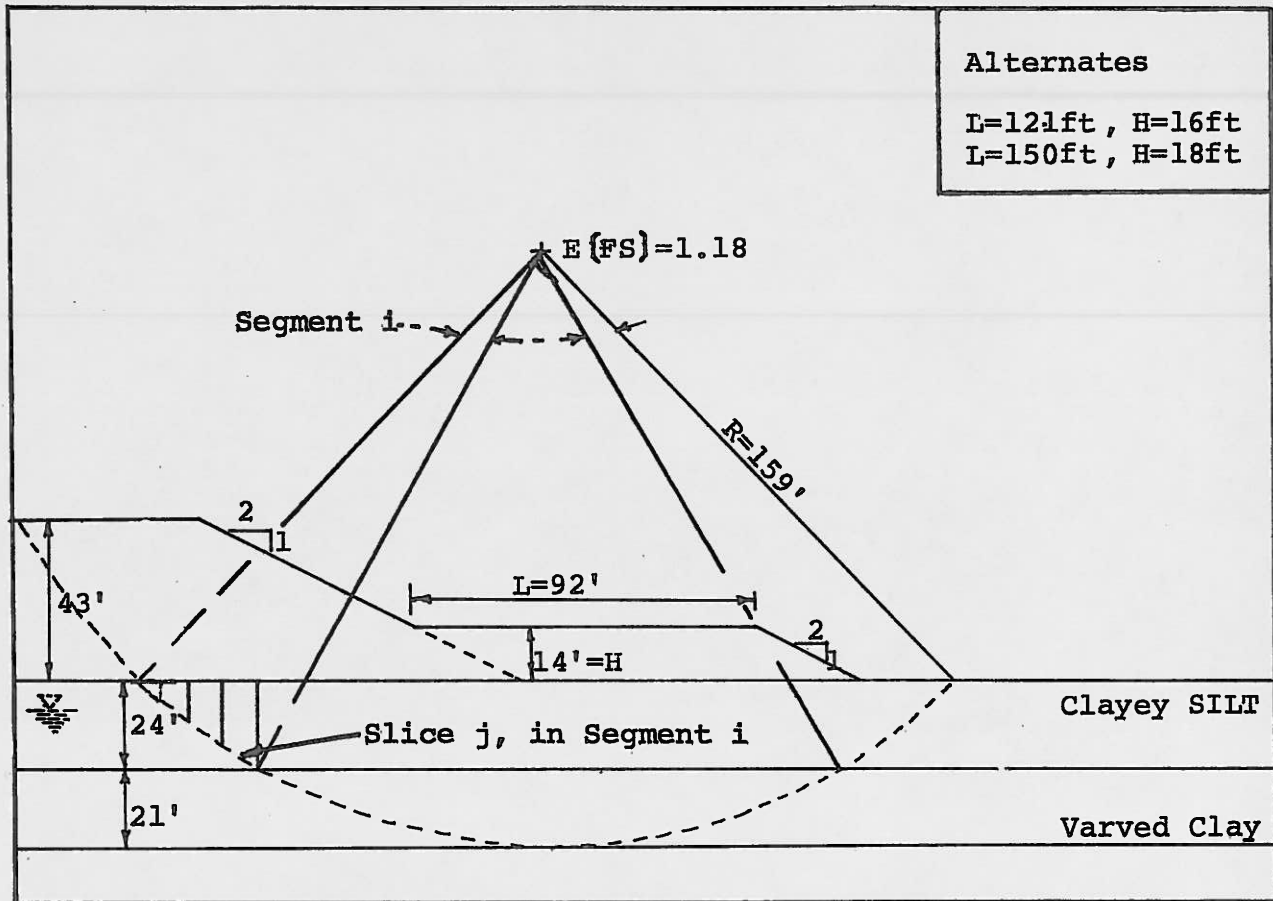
Fair Haven - Design Section No. 1 and Alternate Designs (Haupt and Olsen, 1972).
